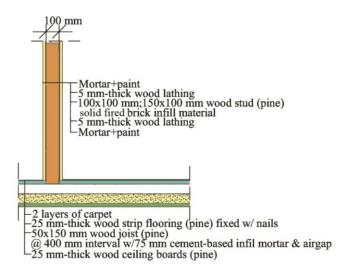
Section of Semi-Repaired-Wall 3 & Semi-Repaired-Floor 2 in 1/20 scale (Drawn by author).
